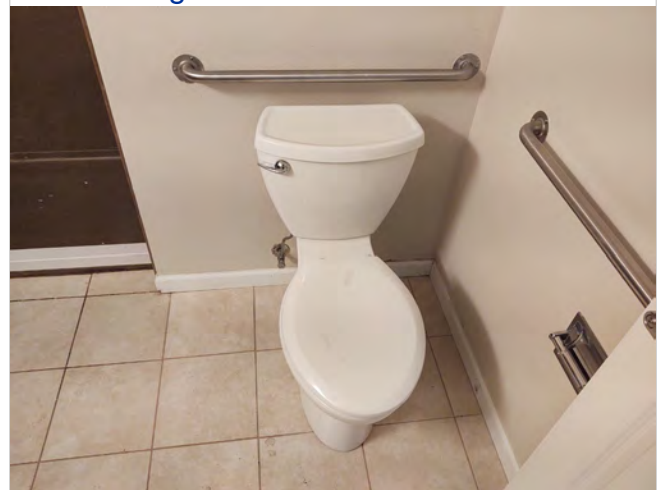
Dwelling Unit C6 - Measured dimension to near edge of rear grab bar at 3” from the side wall.
